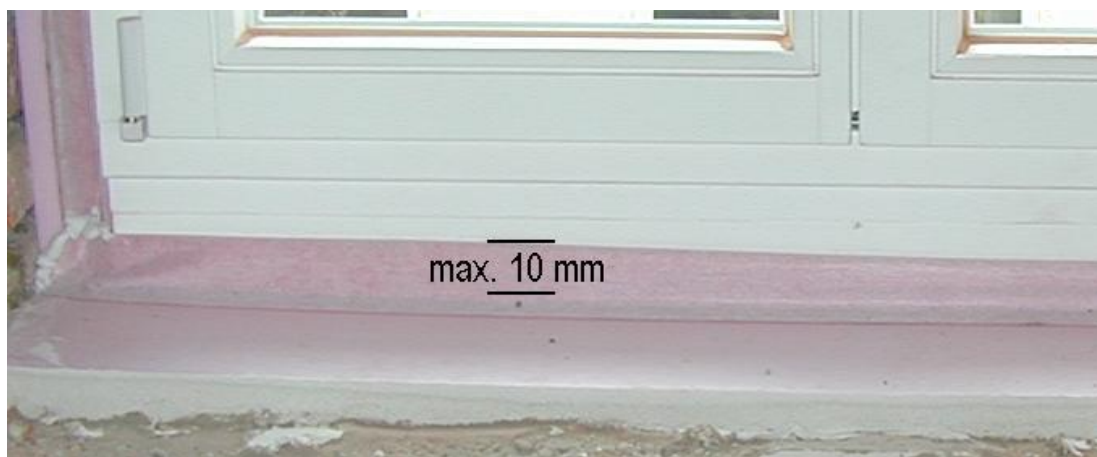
frame prior to mounting of Winflex® tapes version B
